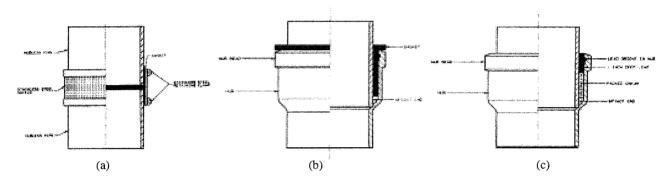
Typical Joints Used to Connect Cast Iron Soil Pipe and Fittings: (a) Typical Hubless Coupling; (b) Compression Joint; (c) Lead and Oakum Joint.
